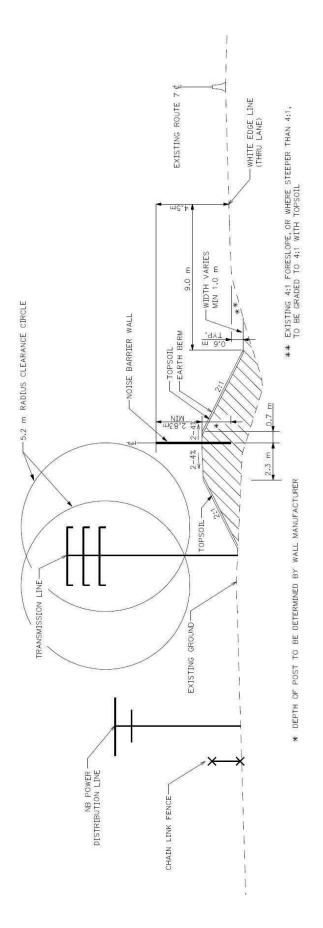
Typical Cross-Section on Route 7 With Noise Barrier
